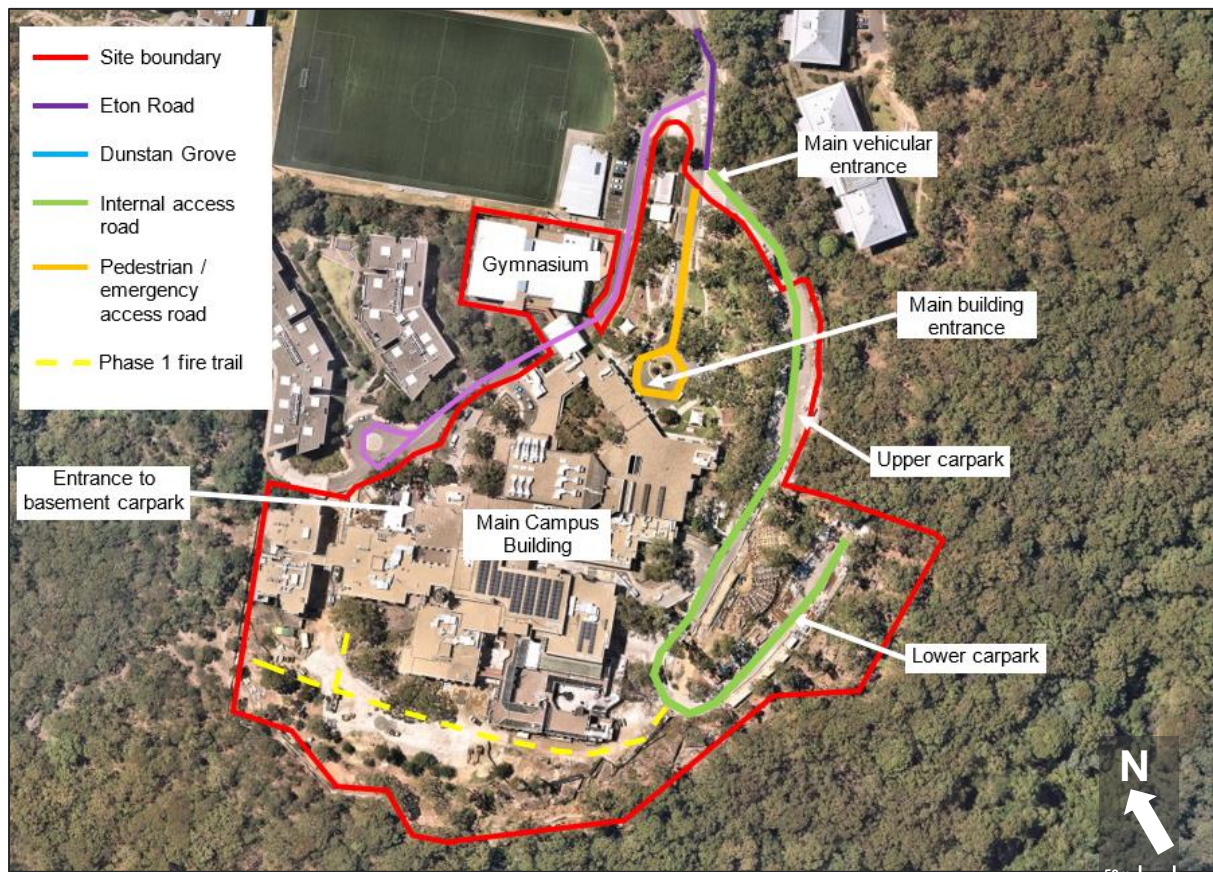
| Aerial view of the site (Source: Nearmap 2021)
